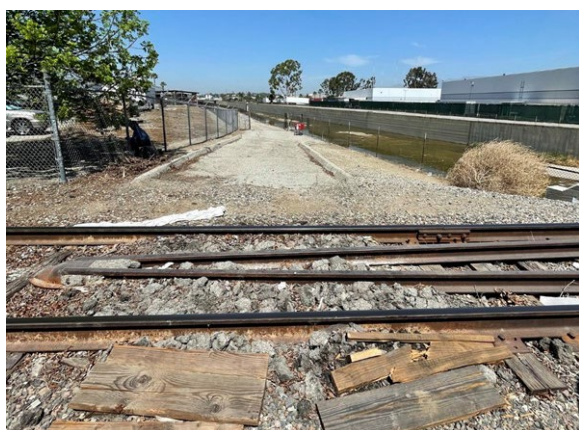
Union Pacific Railroad Tracks Cross San Jose Creek in West Covina, CA
